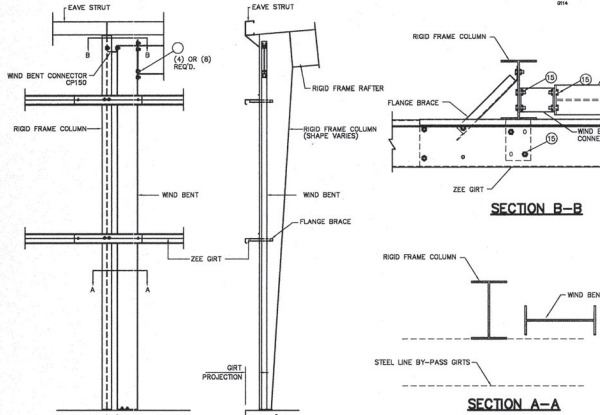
DETAIL: GIRT LAP & FLANGE BRACE PLACEMENT
